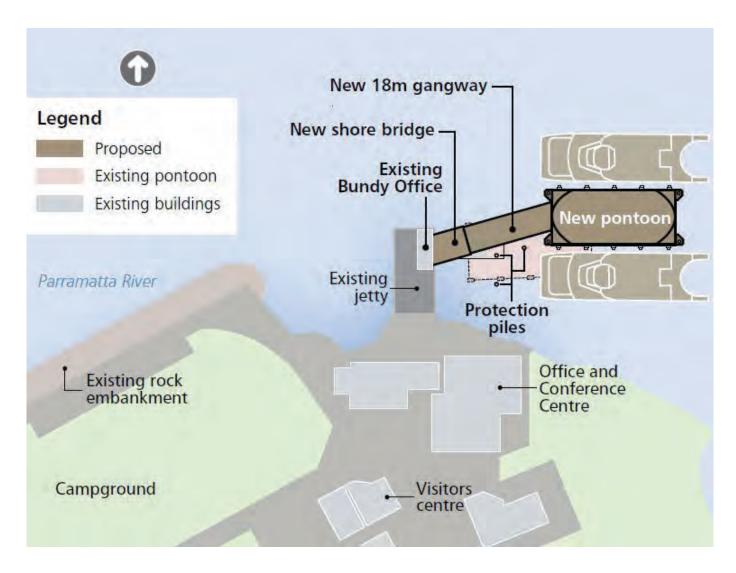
Proposed wharf plan (image courtesy of Conrad Gargett Ancher Mortlock Woolley)
